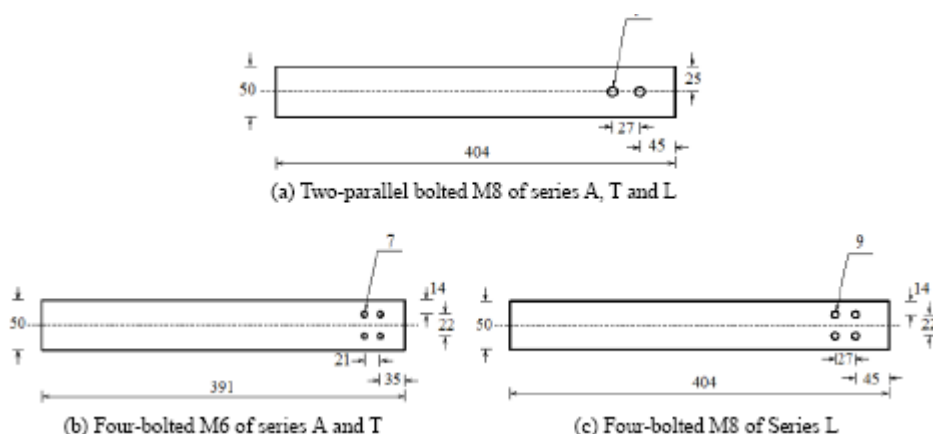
Nominal dimension of double shear (internal plate) bolted connection specimens
